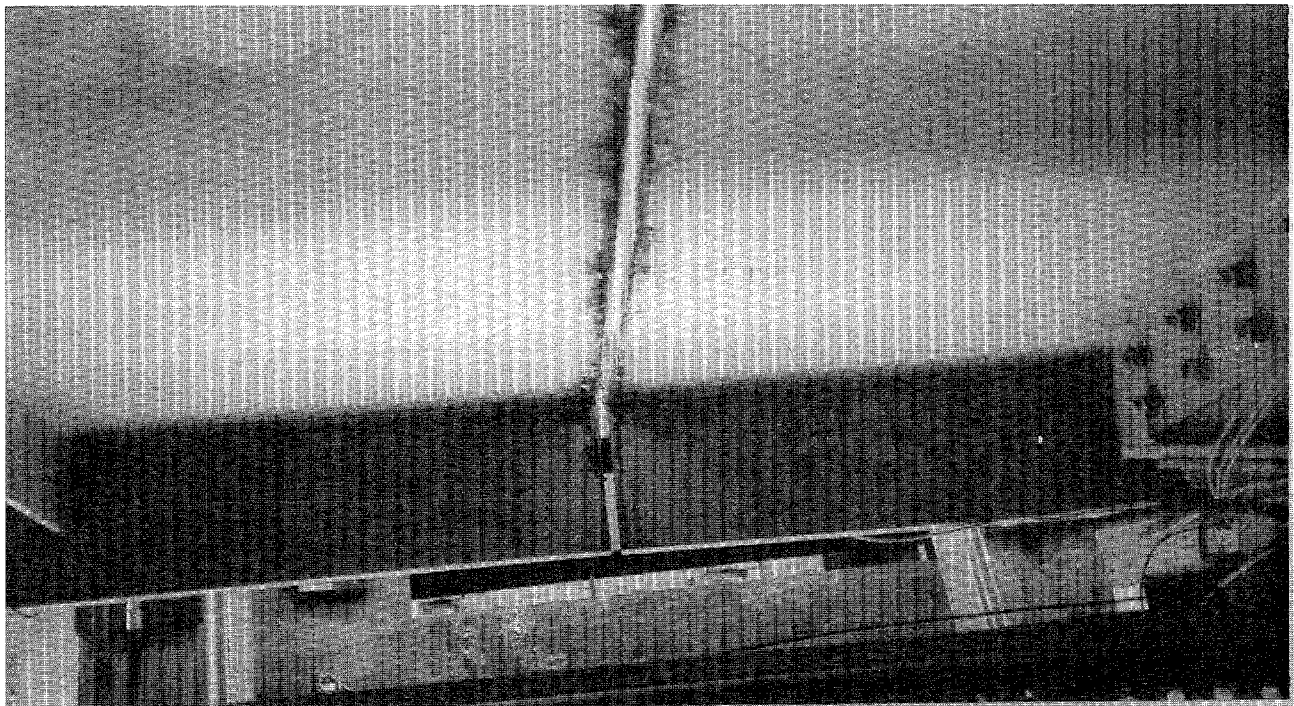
Fourth stage of damage: six-foot cut in the web and cut through the entire bottom flange.
